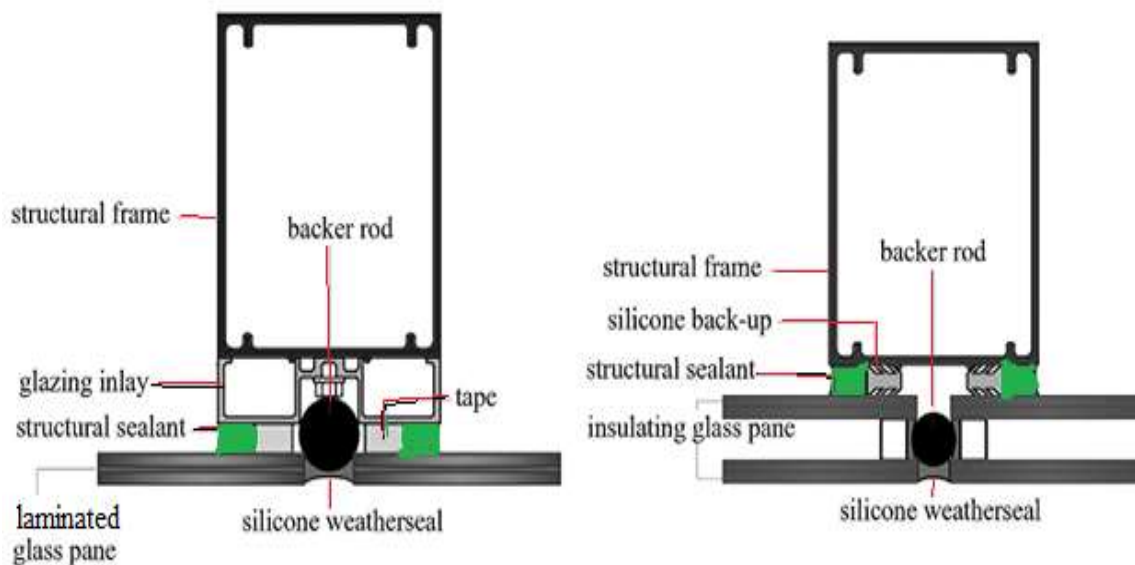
Structural silicone sealant glazing system (Ýlhan & Aygün, 2006)
